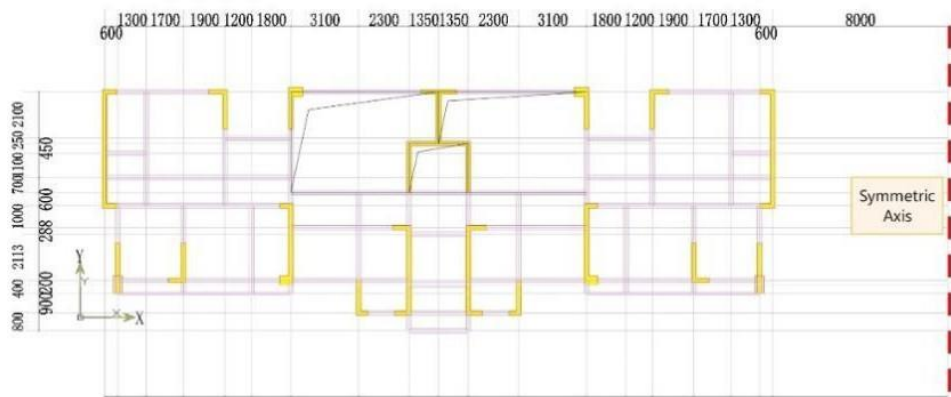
Half plan view of the towers for Model 1 (level 13) [26]
